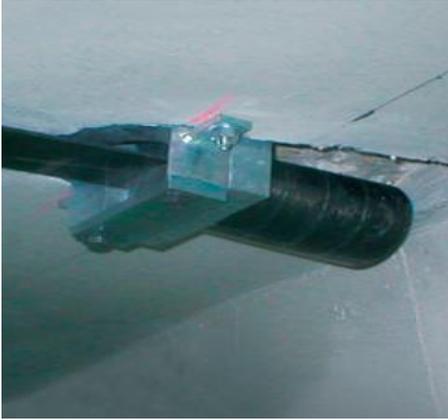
Non-metallic anchoring systems (Kim et al. 2008a).
